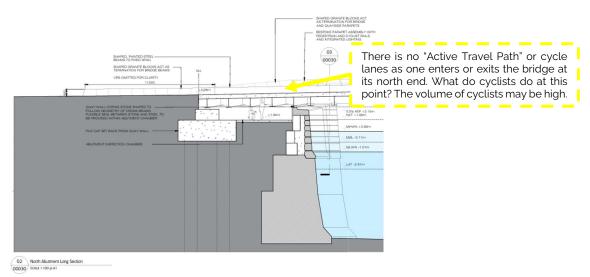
Excerpt from 'SPAR Bridge Proposed North Abutment Detail Arrangement' (Source: Dwg. No. MOXON-SBR-SP-DR-A-100-00030)
